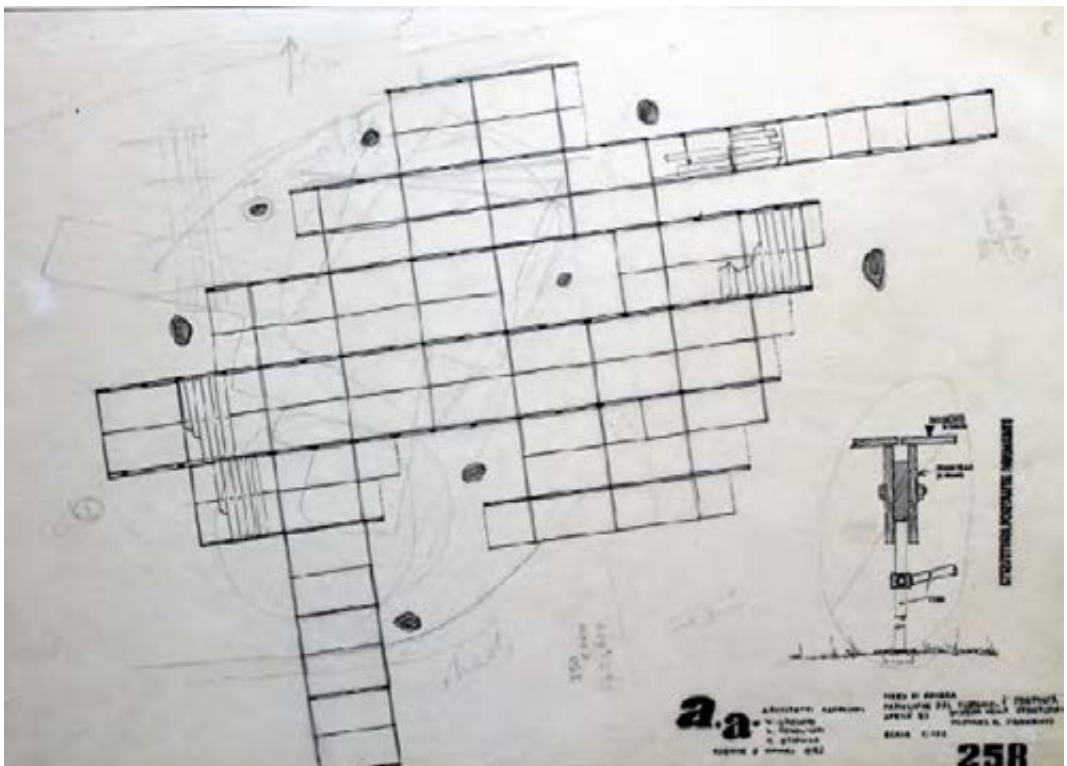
Novara Fair Trade Pavilion first solution_CASVA concession
